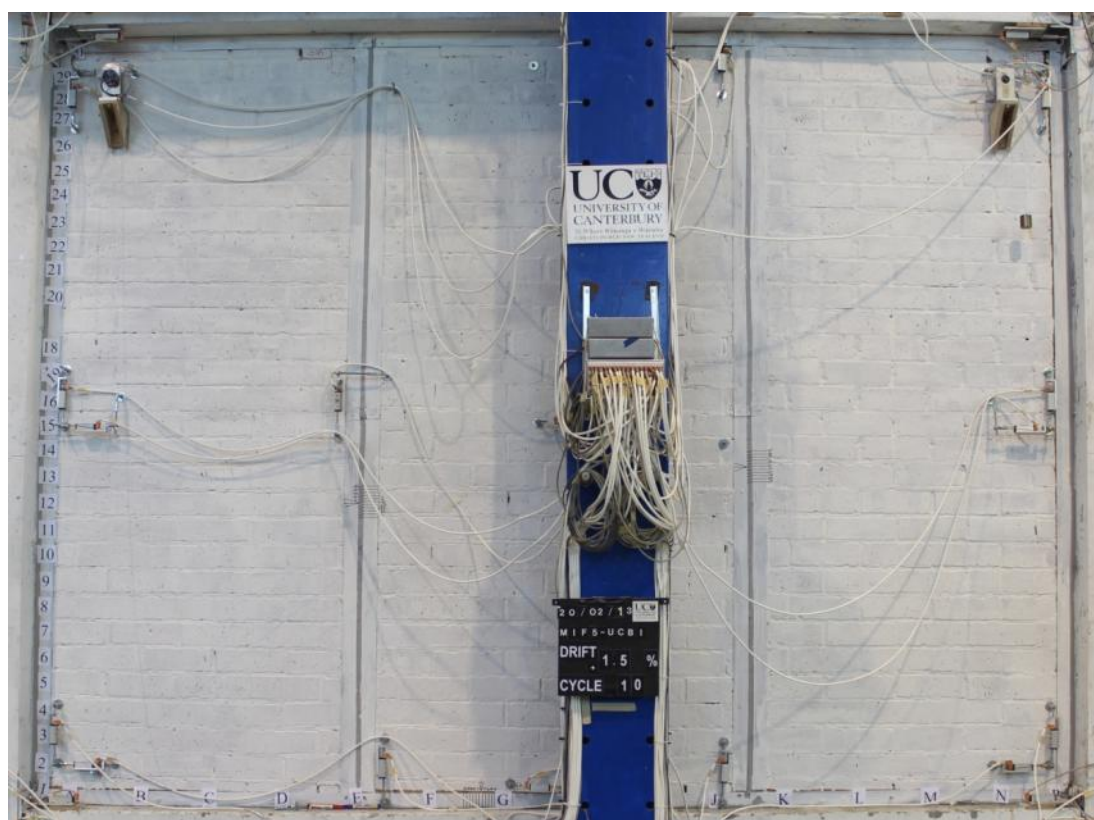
Low damage unreinforced clay brick infill wall specimen MIF5-UCBI after the installation of the polyurethane structural joint sealant
